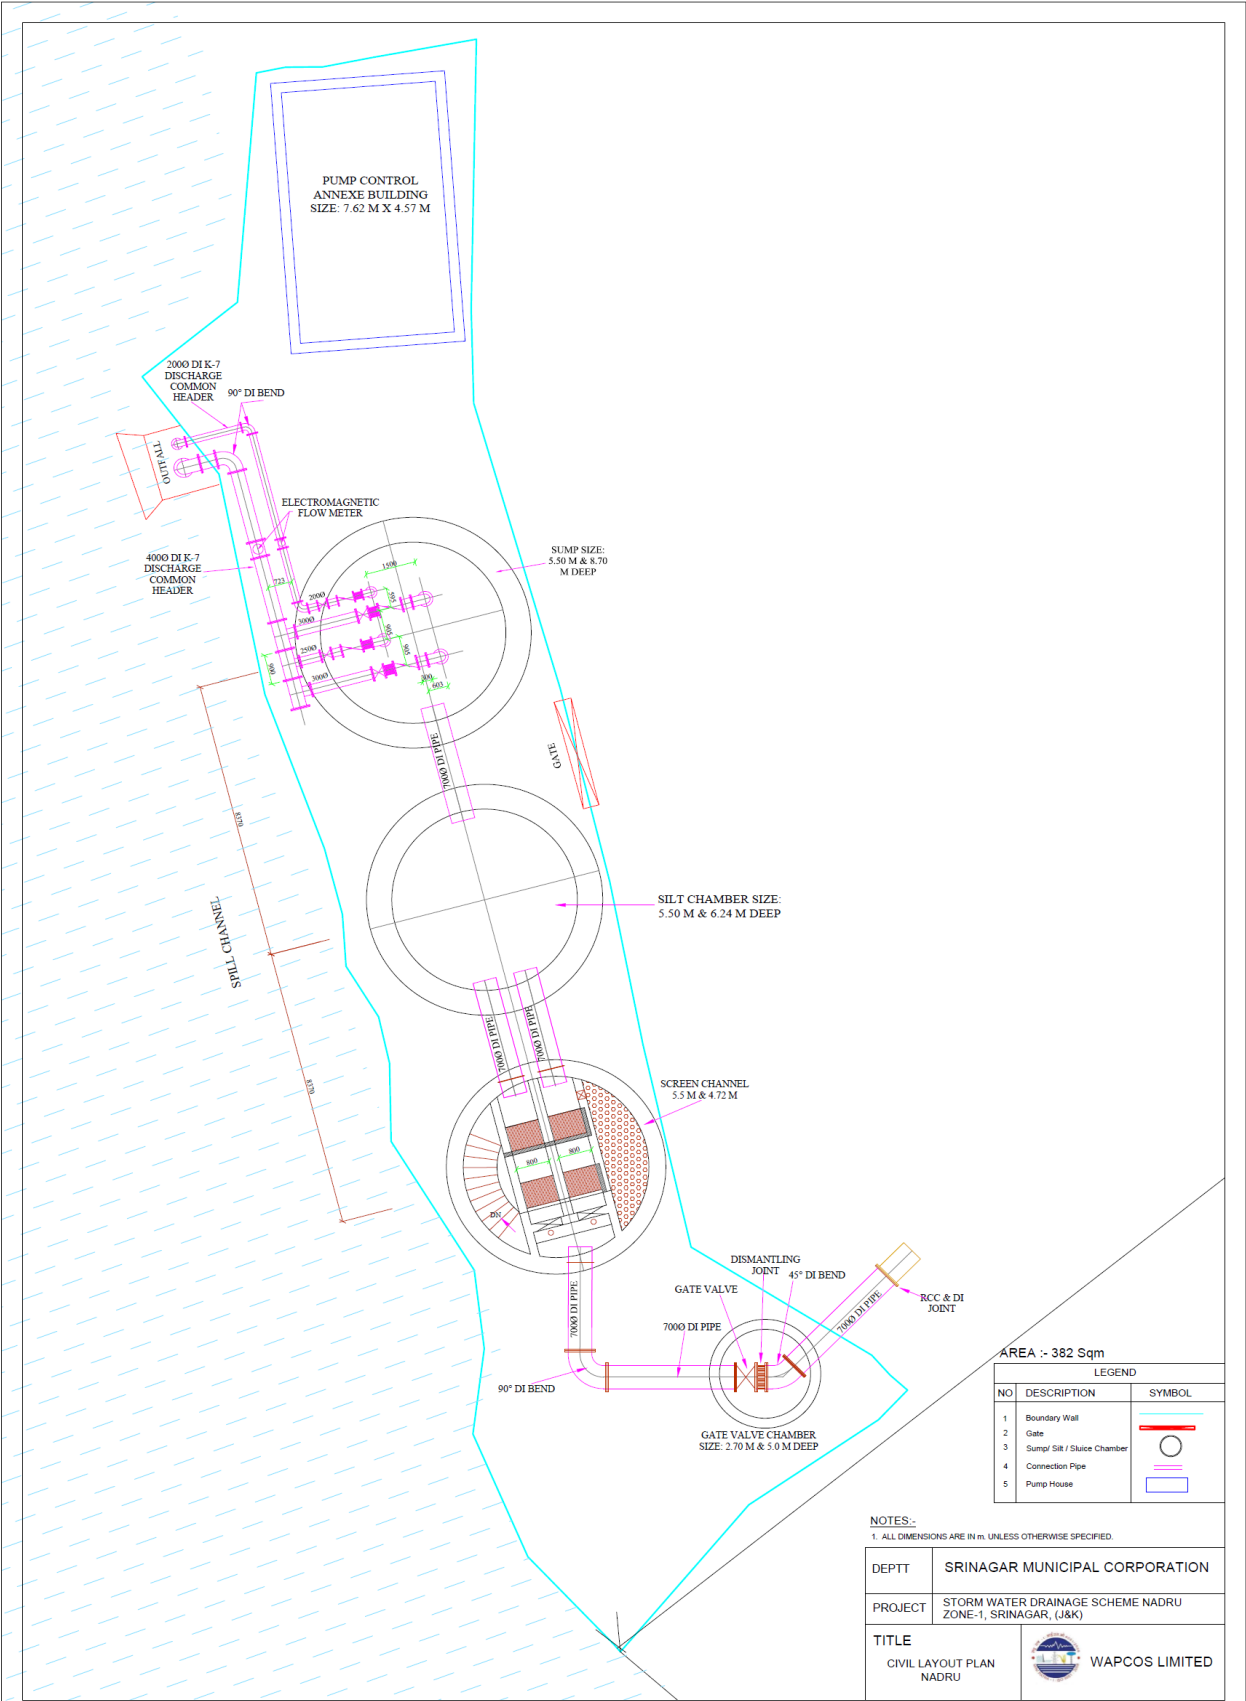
Layout Plan of Proposed Pumping Station of Storm Water Drainage in Nadru Zone-1.
